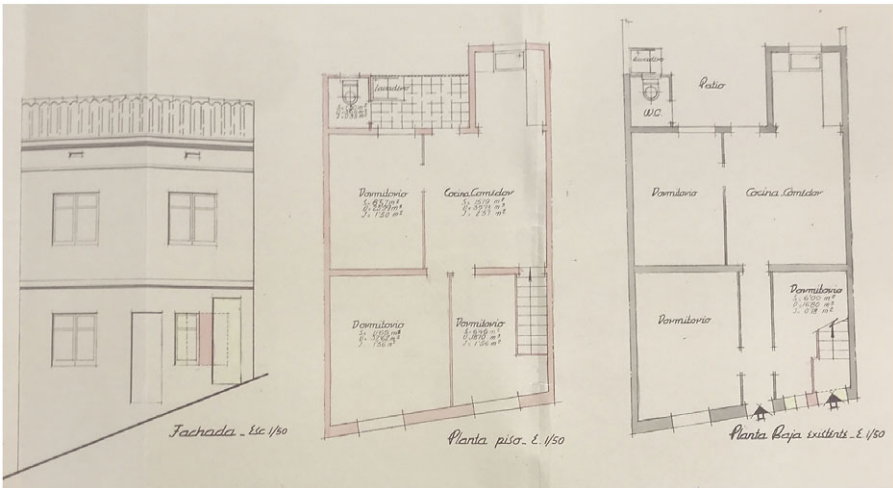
Passatge del Dipòsit 11, second design by F. Sanllehi Pont (1955) with an added first floor and an added street entrance for the first-floor users (AMCB Q-132, 49471).
